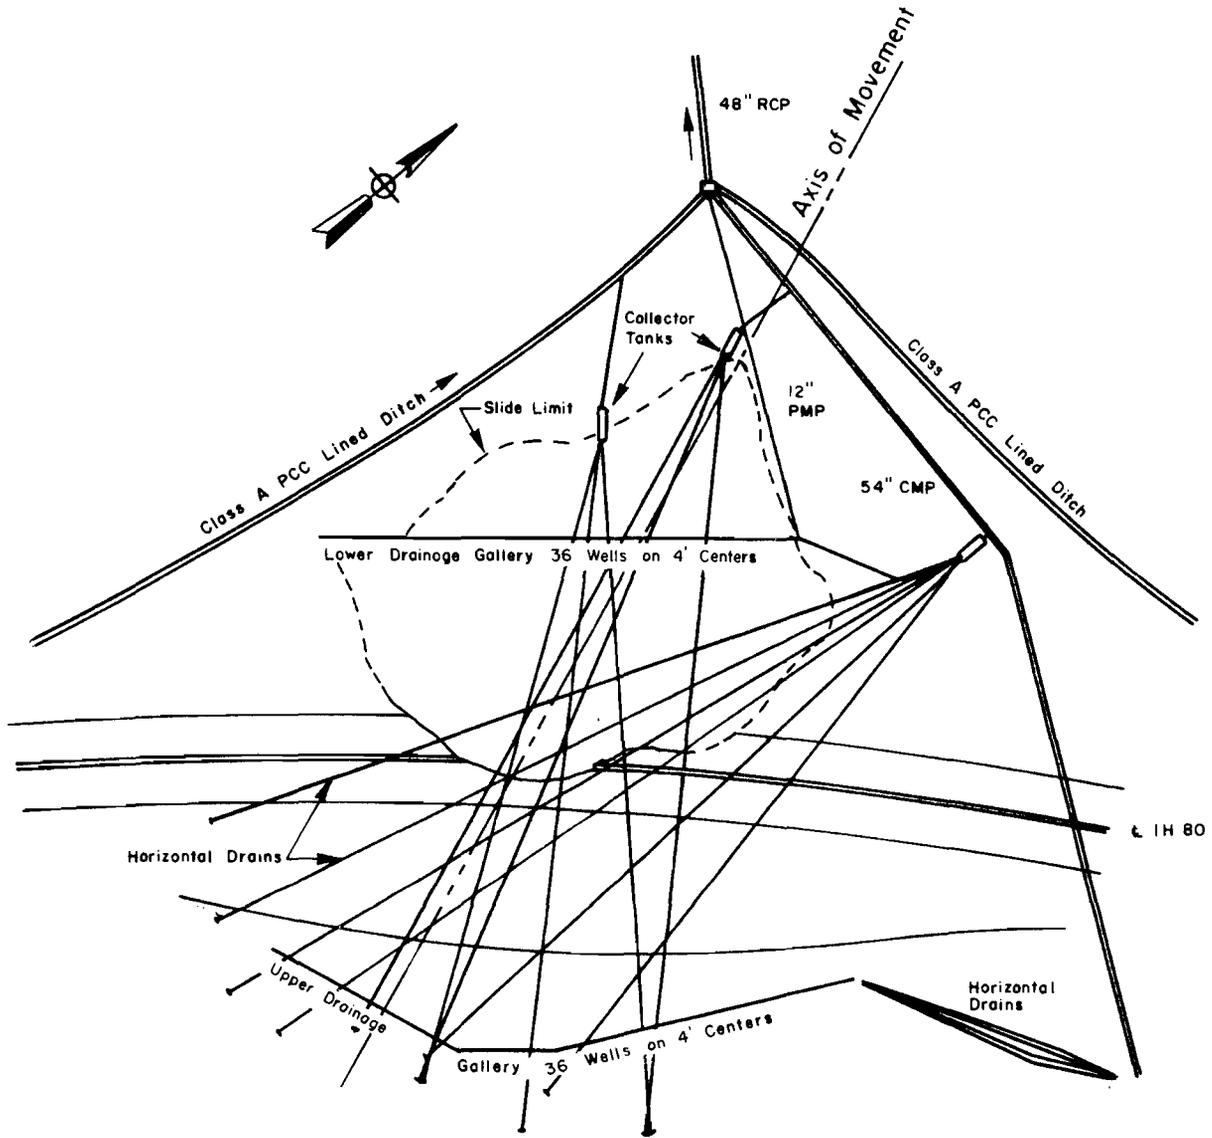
Plan view of drainage system - Pinole slide (Smith et al, 1970).
